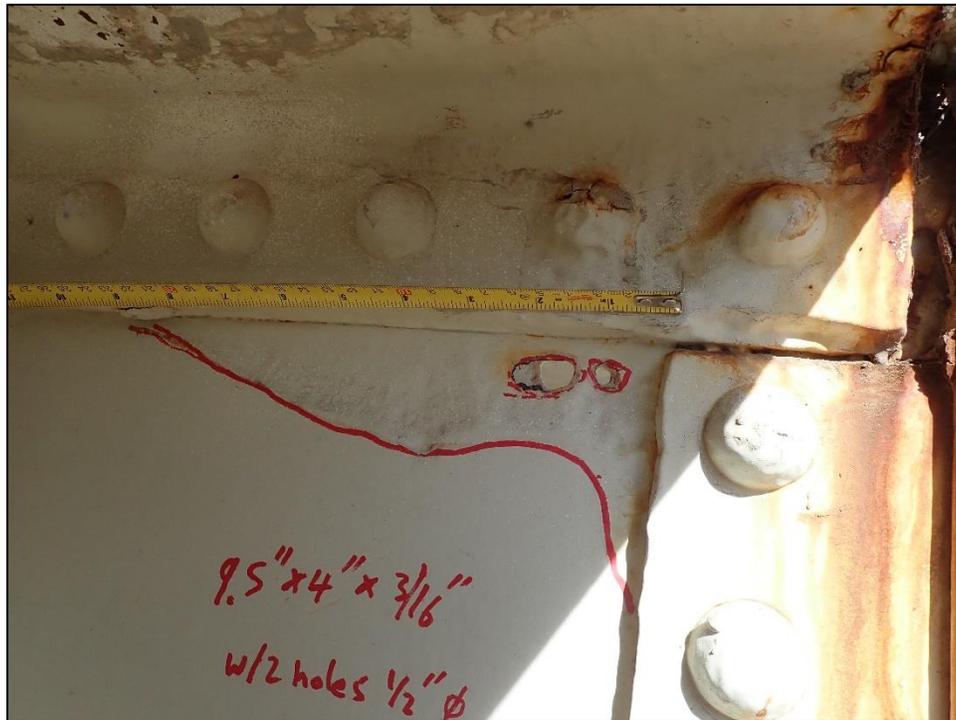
Span 4, floor beam 6, east end; corrosion holes up to 2-in diameter with adjacent painted-over tapered section loss
